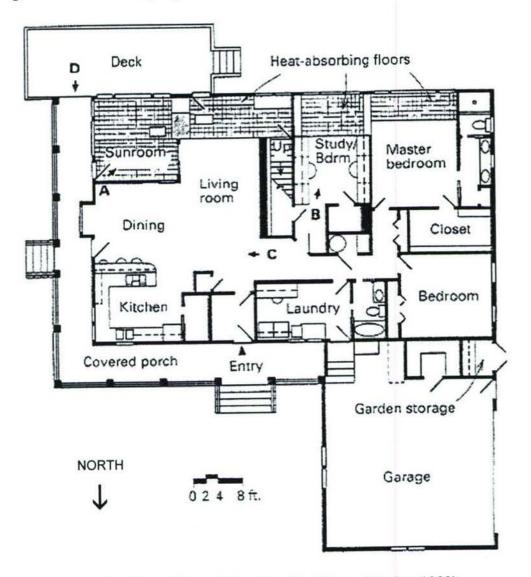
Floor Plan of Plumblee Residence (Rucker 1993)
